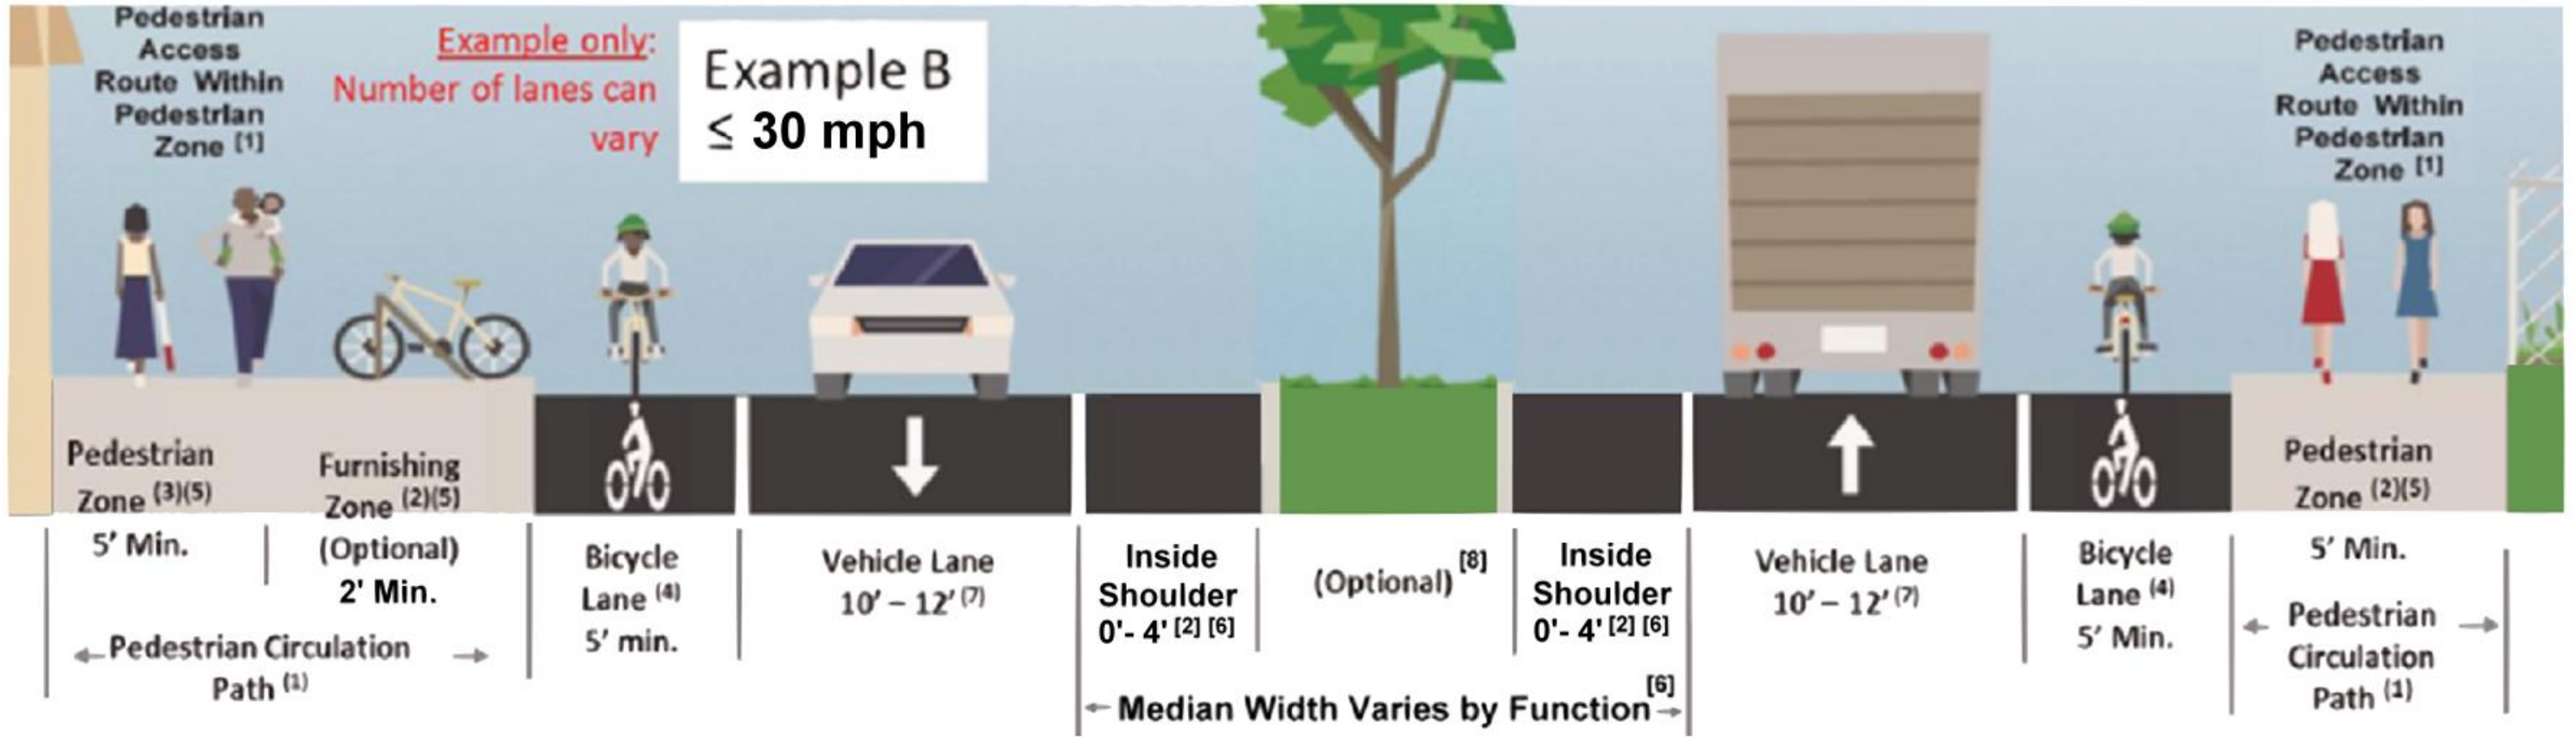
Cross Sections Featuring Bicycle Facilities
